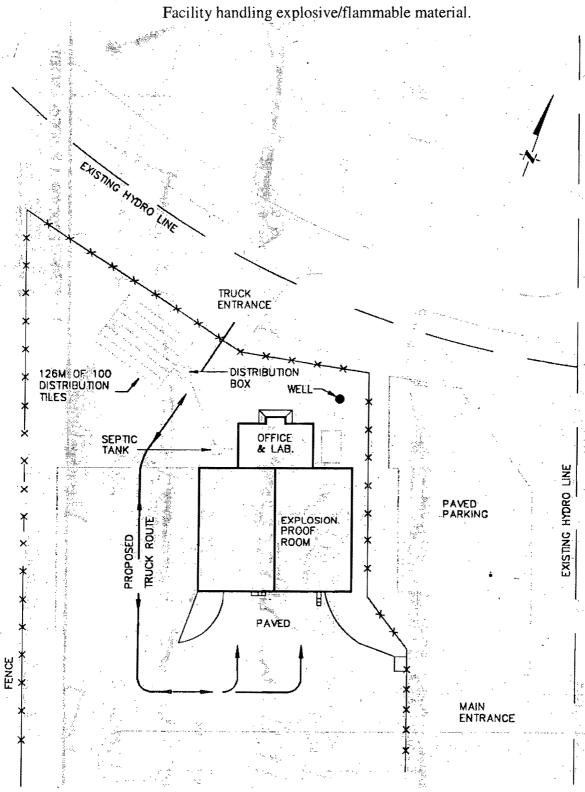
TYPICAL SITE LAYOUT OF WASTE TRANSFER FACILITY
